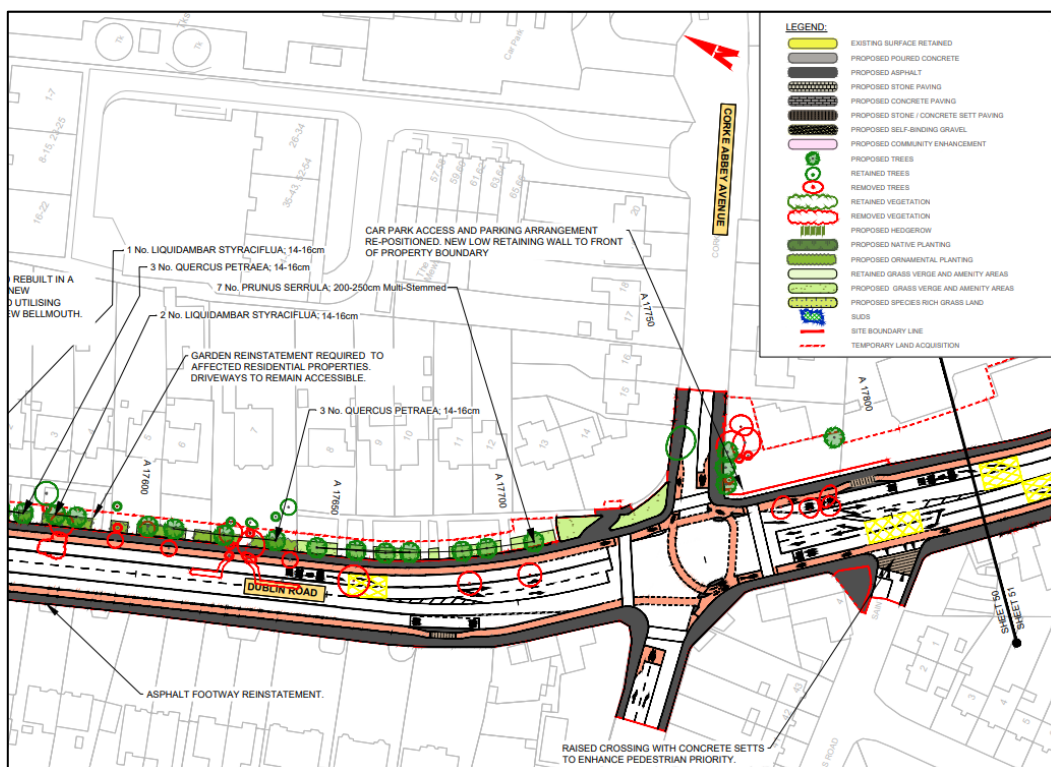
Extract from Landscaping Design Drawings at Dublin Road (Sheet 50)
